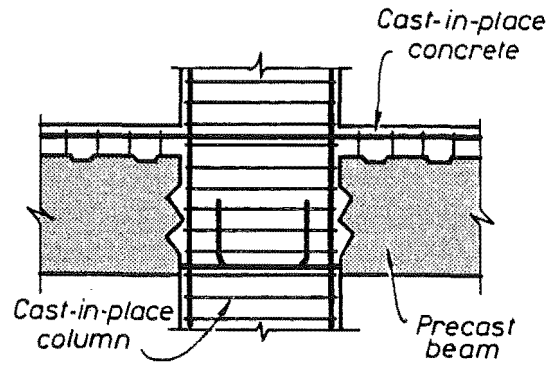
Common Arrangement for the Construction of Framed Multistorey Buildings in Romania [Constantinescu (1985)].
